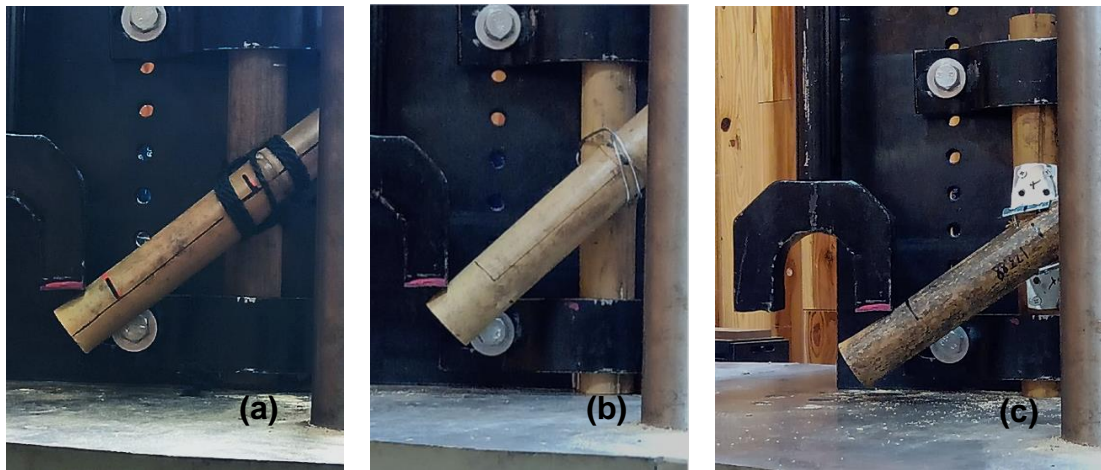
Failure mode of rotation test in lashing joint (a), iron wire joint (b) and steel angle bracket joint(c)
